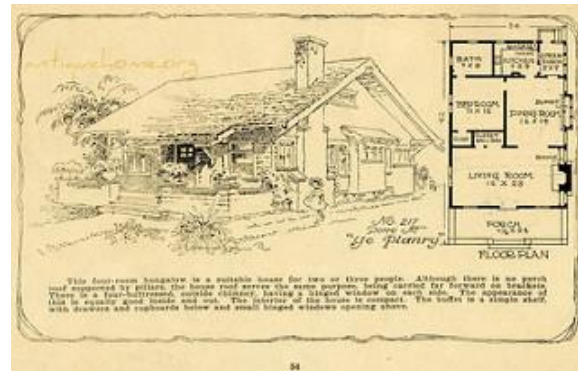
The 1908 "Ye Planry" is an example of a Craftsman bungalow kit house. Source: First
